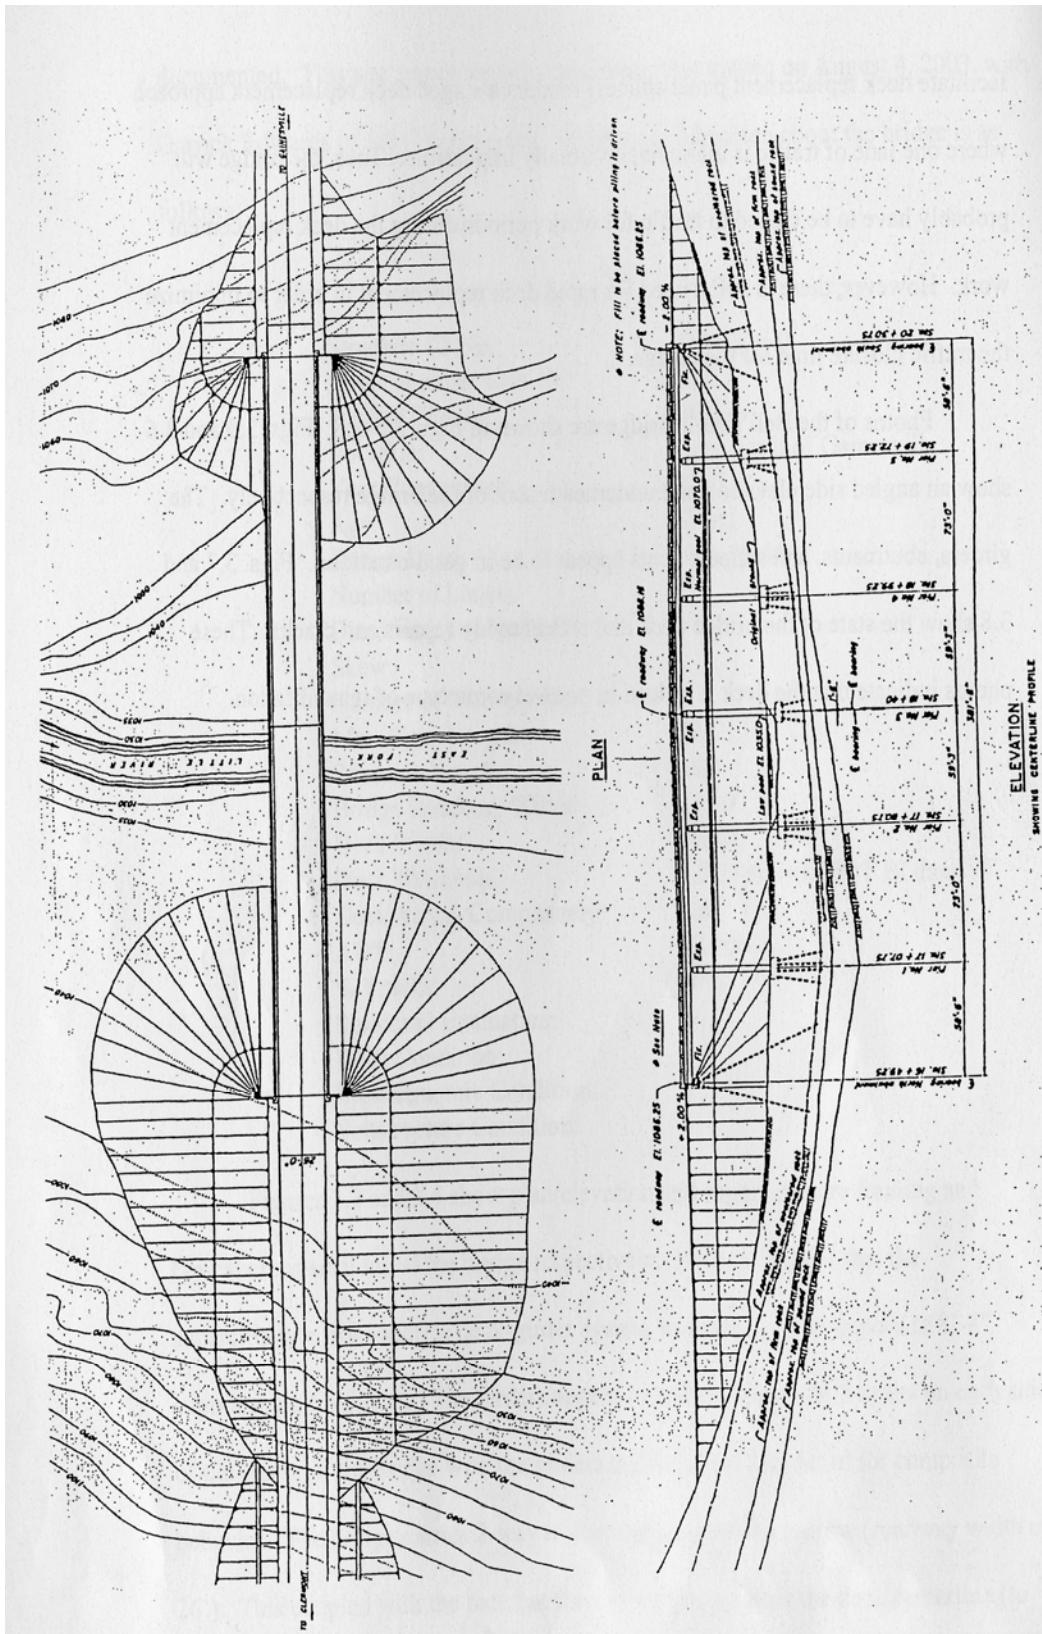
Plan and Elevation of Bells Mill Bridge (2)
